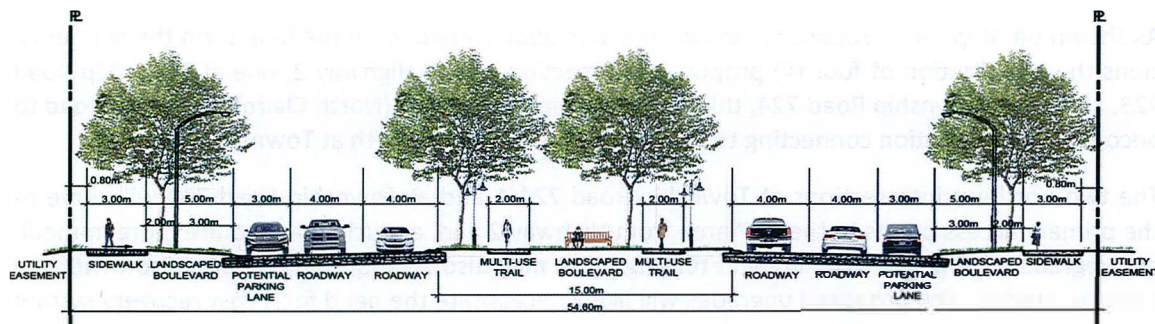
Clairmont (Grand) Boulevard Cross Section
